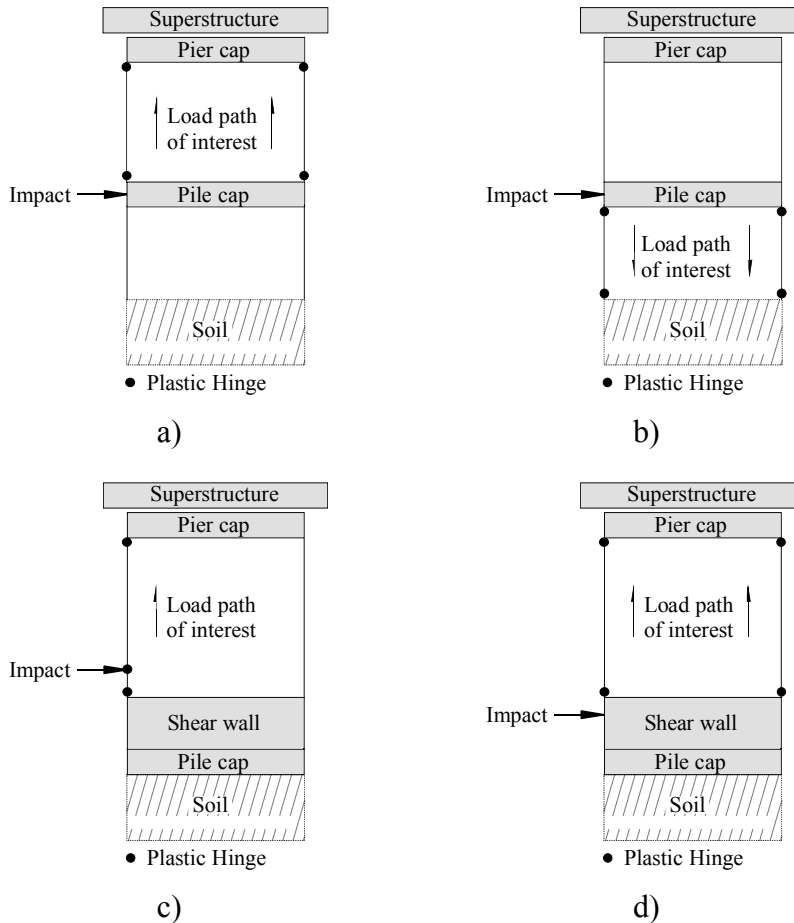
Collapse mechanisms considered. a) Pier column collapse mechanism for pile cap impact; b) Pile collapse mechanism for pile cap impact; c) Pier column collapse mechanism for pier column impact; d) Pier column collapse mechanism for shear wall impact
